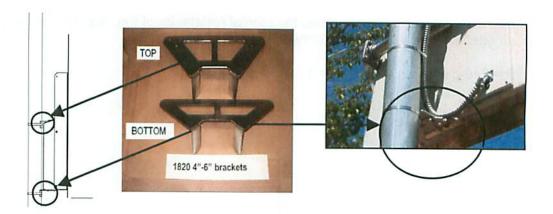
Bracket details. Photograph on right shows bottom bracket attached with steel strap. U-bolts will actually be used.
